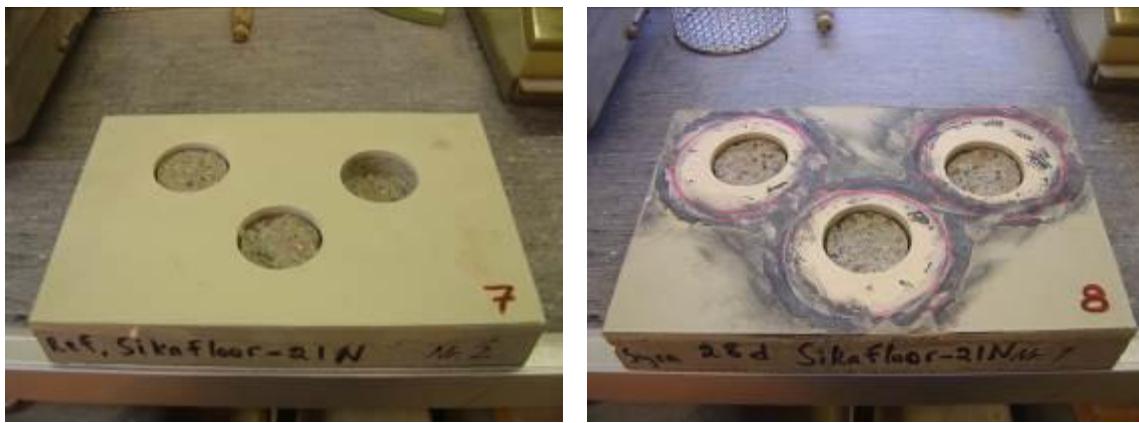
Test slabs with system 5G after pull-off testing, without exposure (left hand picture) and after exposure (right hand picture).
